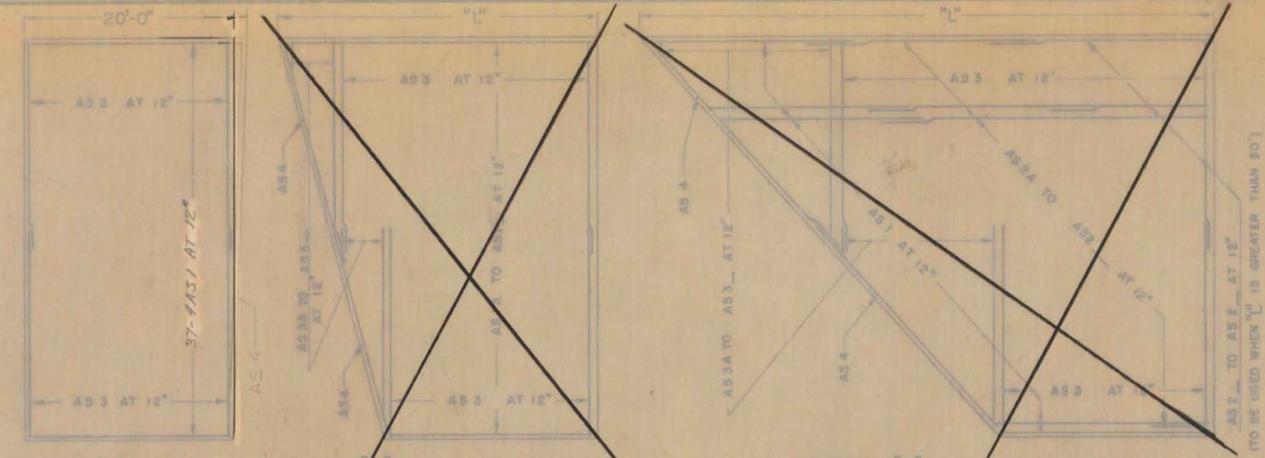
DETAILS OF APPROACH SLAB FOR 36'-8" FOOT BRIDGE (W19TH)
